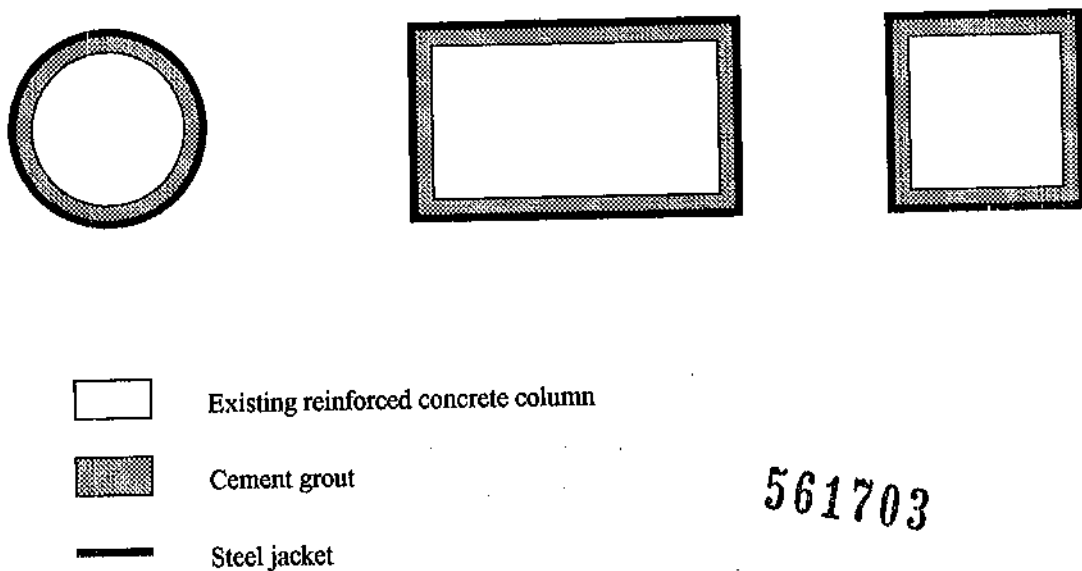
Steel Jacketing of Reinforced Concrete Columns
